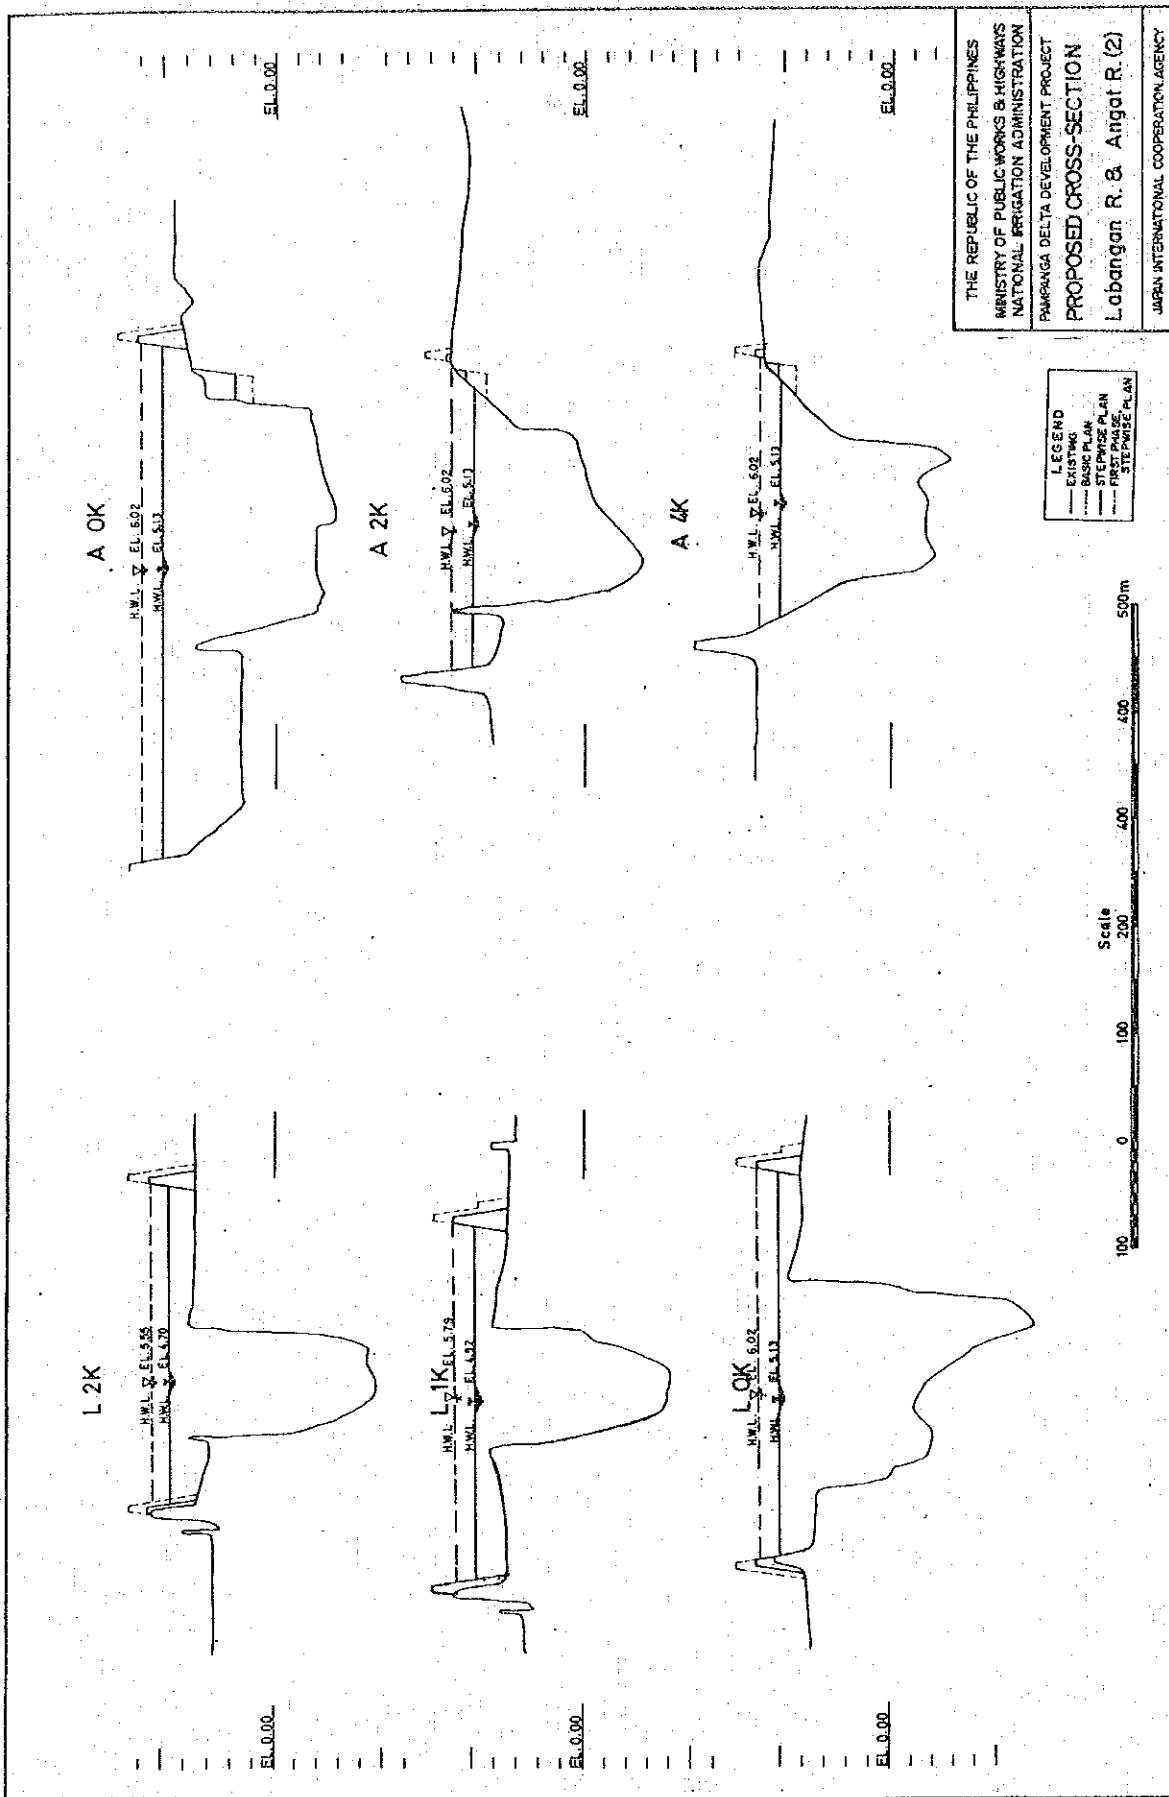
(15) PROPOSED CHANNEL CROSS-SECTION
